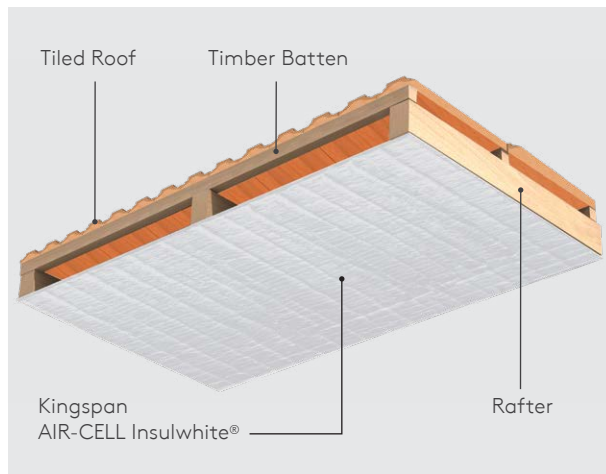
Kingspan AIR-CELL Insulwhite® in a pitched timber framed tiled roof retrofit installation (attic conversion).
